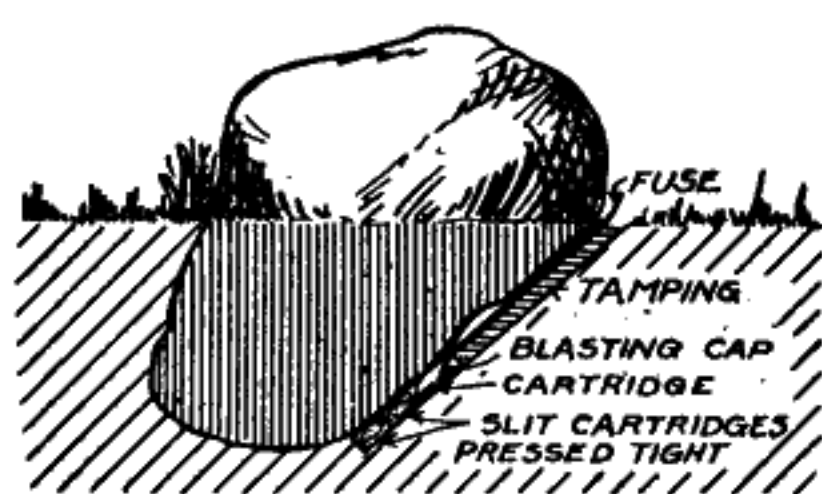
Proper method of placing and loading a boulder for breaking or moving it with a snake-hole shot.
